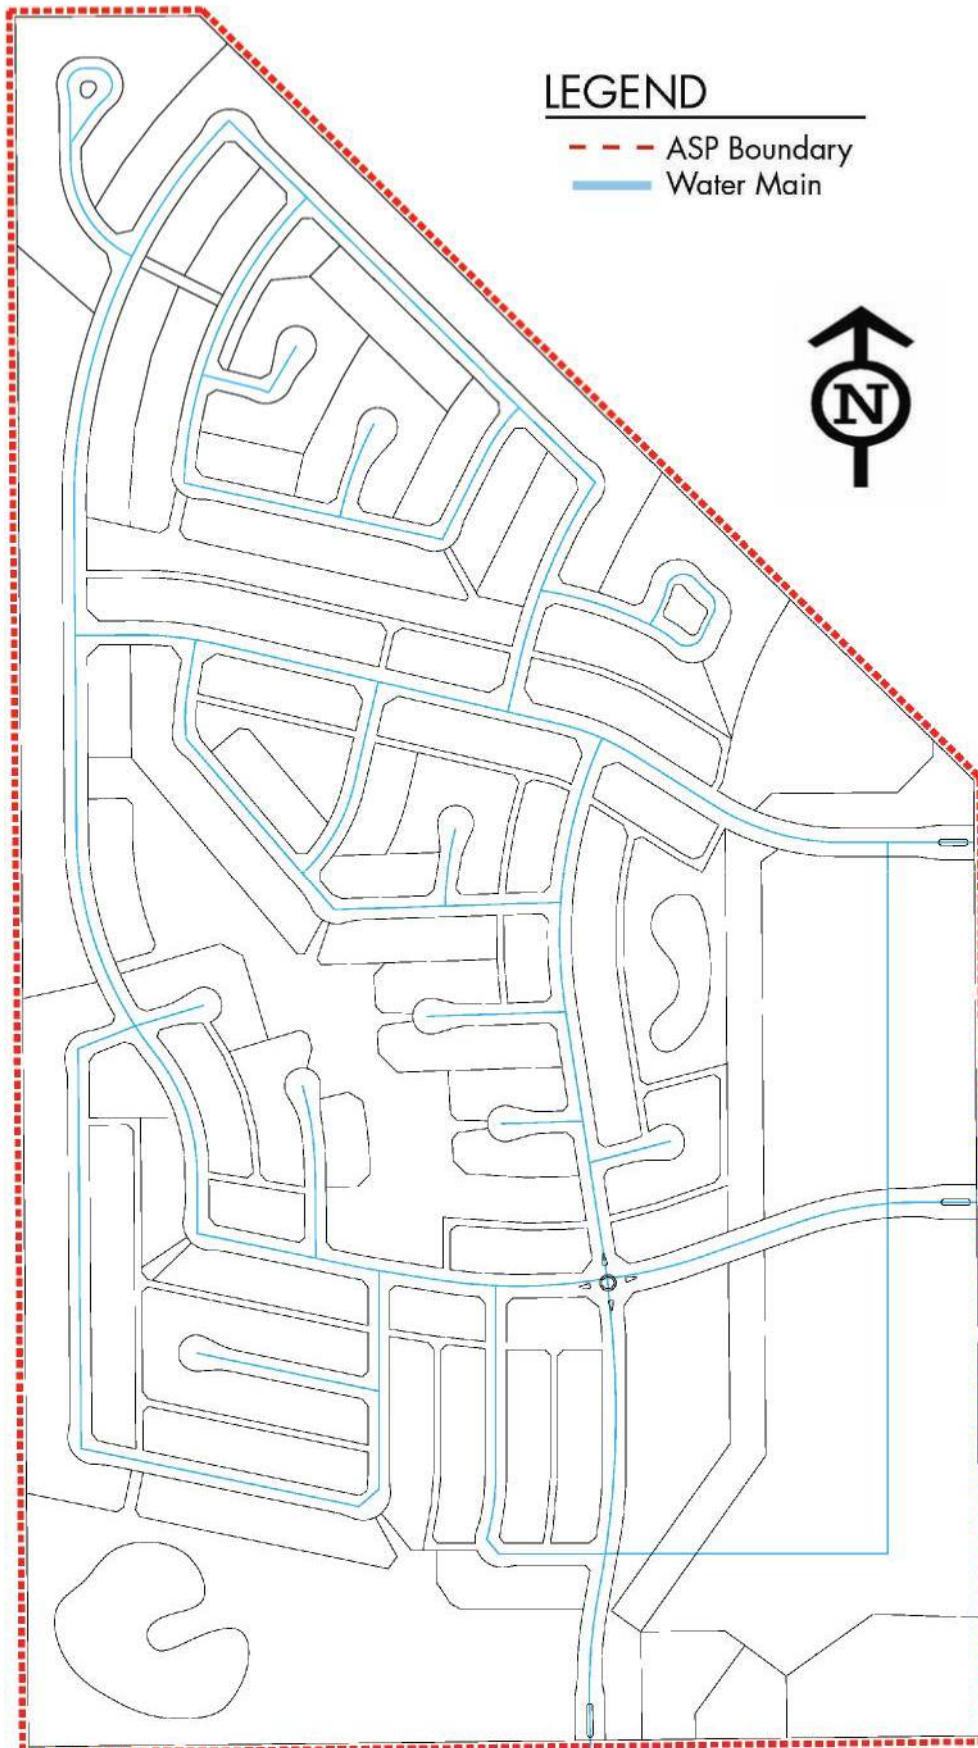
WATER DISTRIBUTION PLAN
